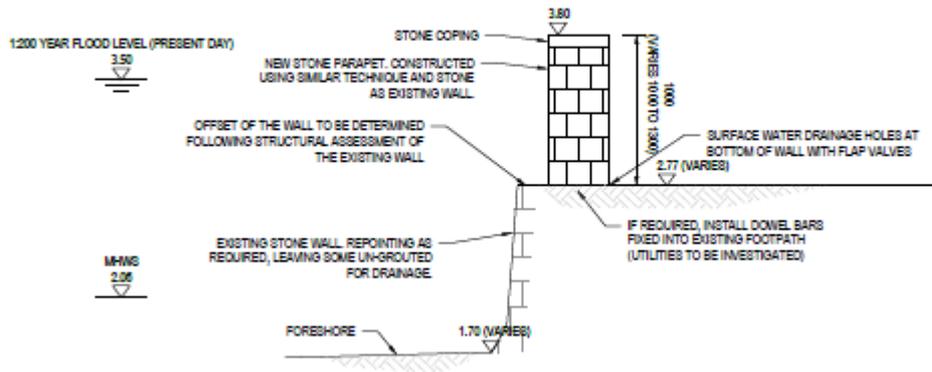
Sketch showing indicative cross section of frontline floodwall at ODU 3k (not to scale)
